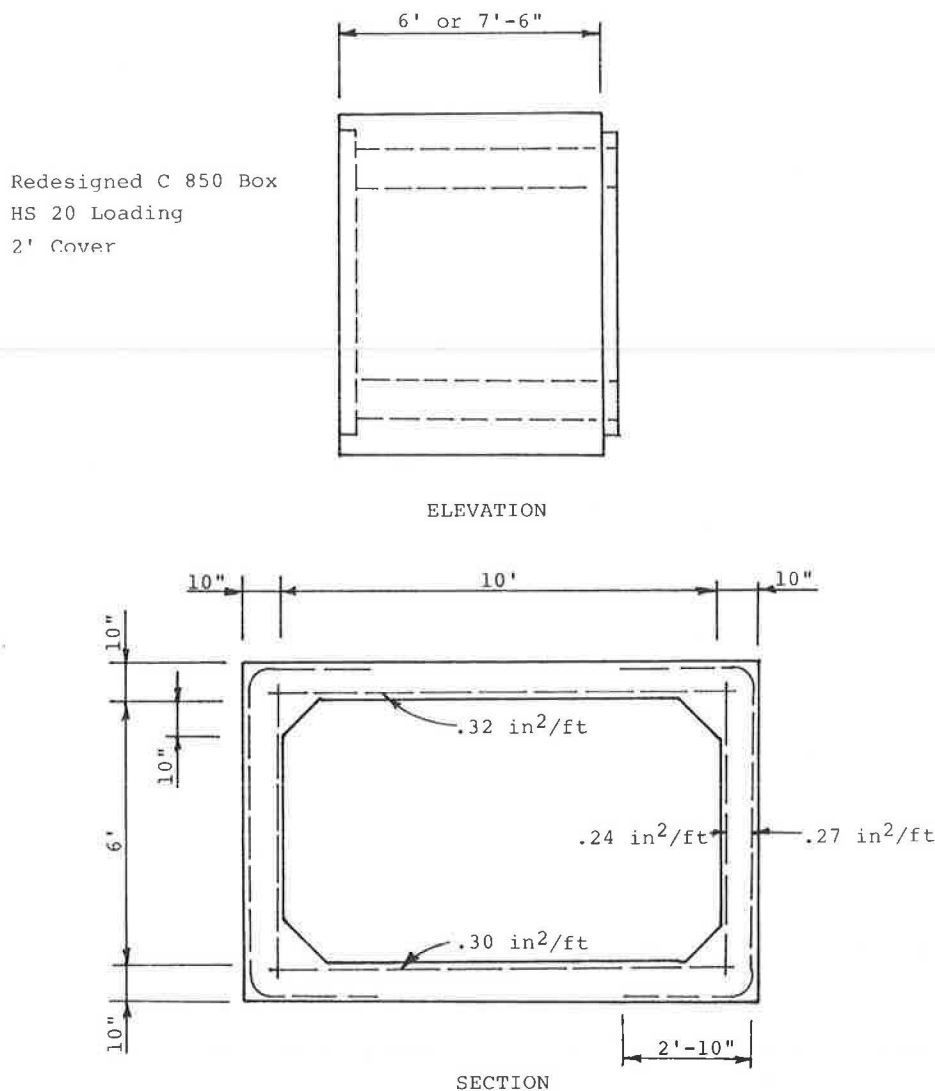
Details of redesigned 10-ft by 6-ft box culvert (Ohio DOT bridge CRA-19-17.10).
